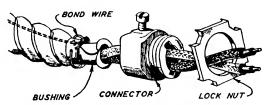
Method of Inserting Fiber Bushing, and Connector on Armored Cable
